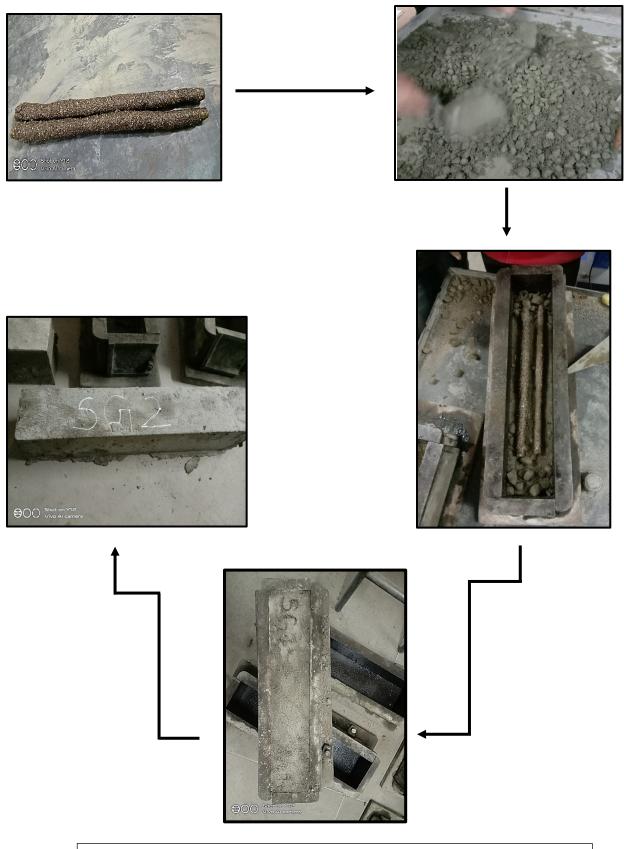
Preparation of sand-coated GFRP reinforced beam specimen (type III)
